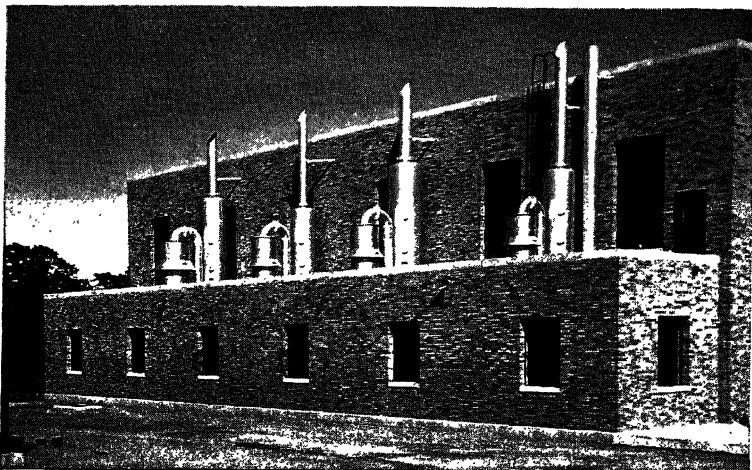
Air filters and exhaust snubbers mounted on roof of plant shop. Access is gained by a stairway inside the plant.
